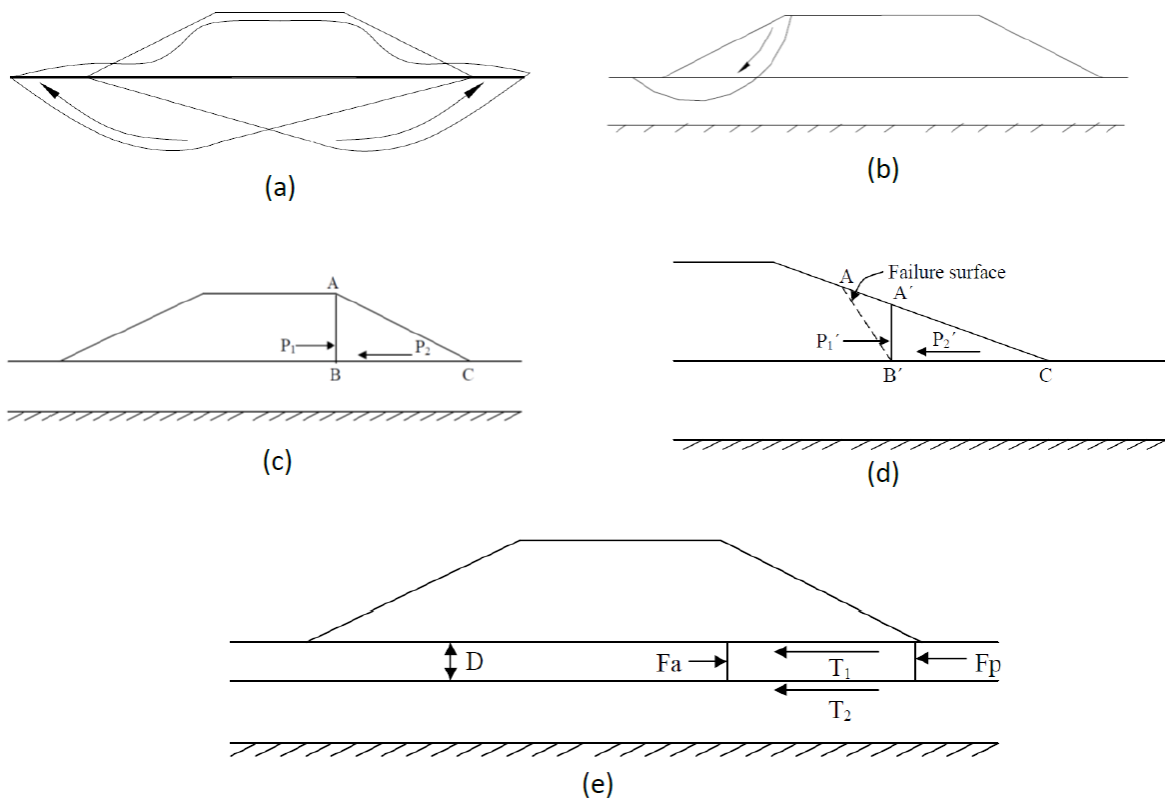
4 (a) Bearing capacity failure; (b) rotational failure; (c) sliding failure; (d) spreading failure; (e) foundation soil squeezing failure.
